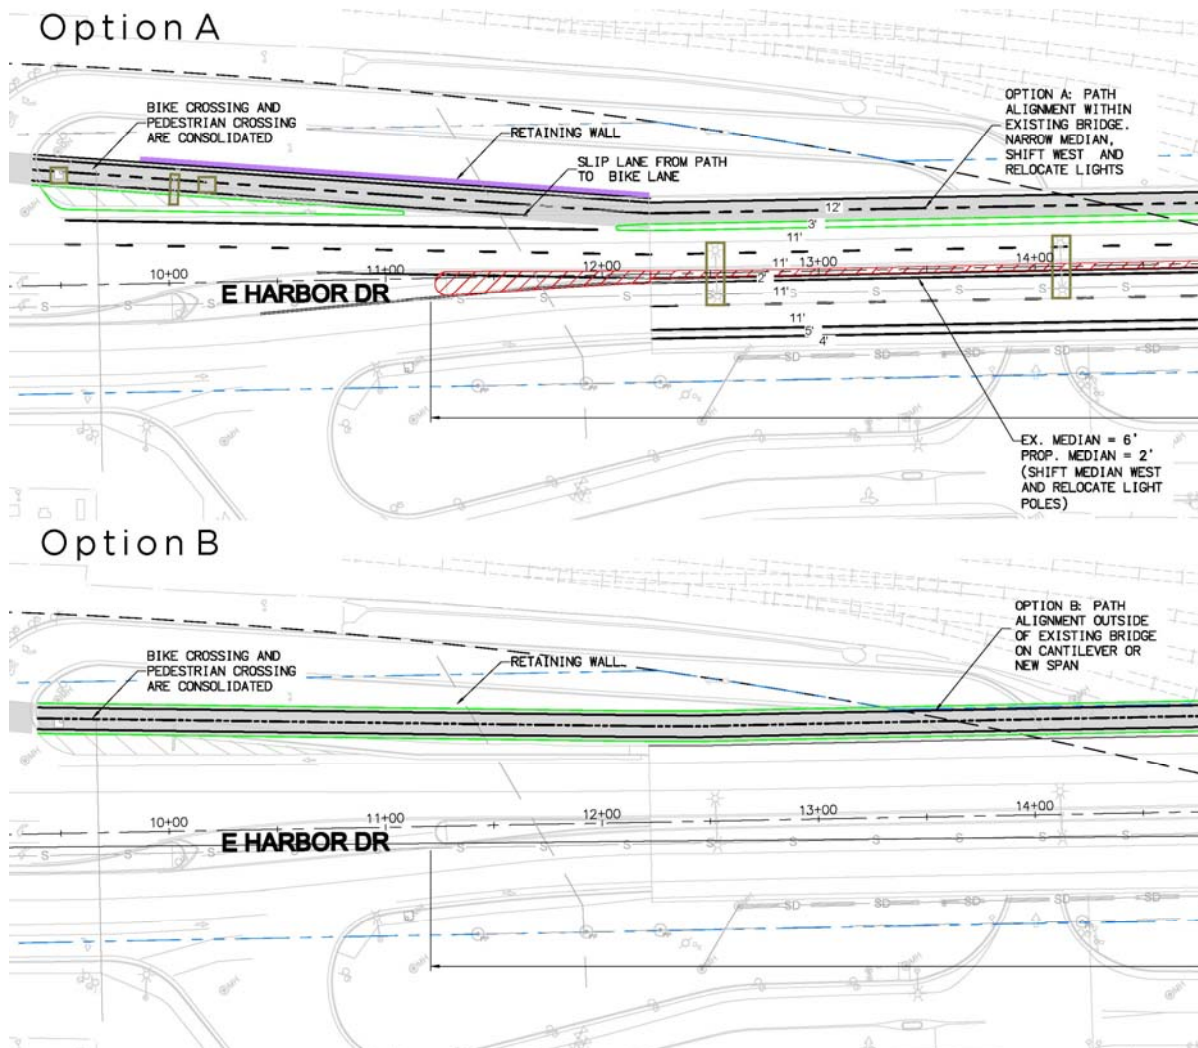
Proposed alignments on Harbor Drive Bridge over BNSF Railroad.
